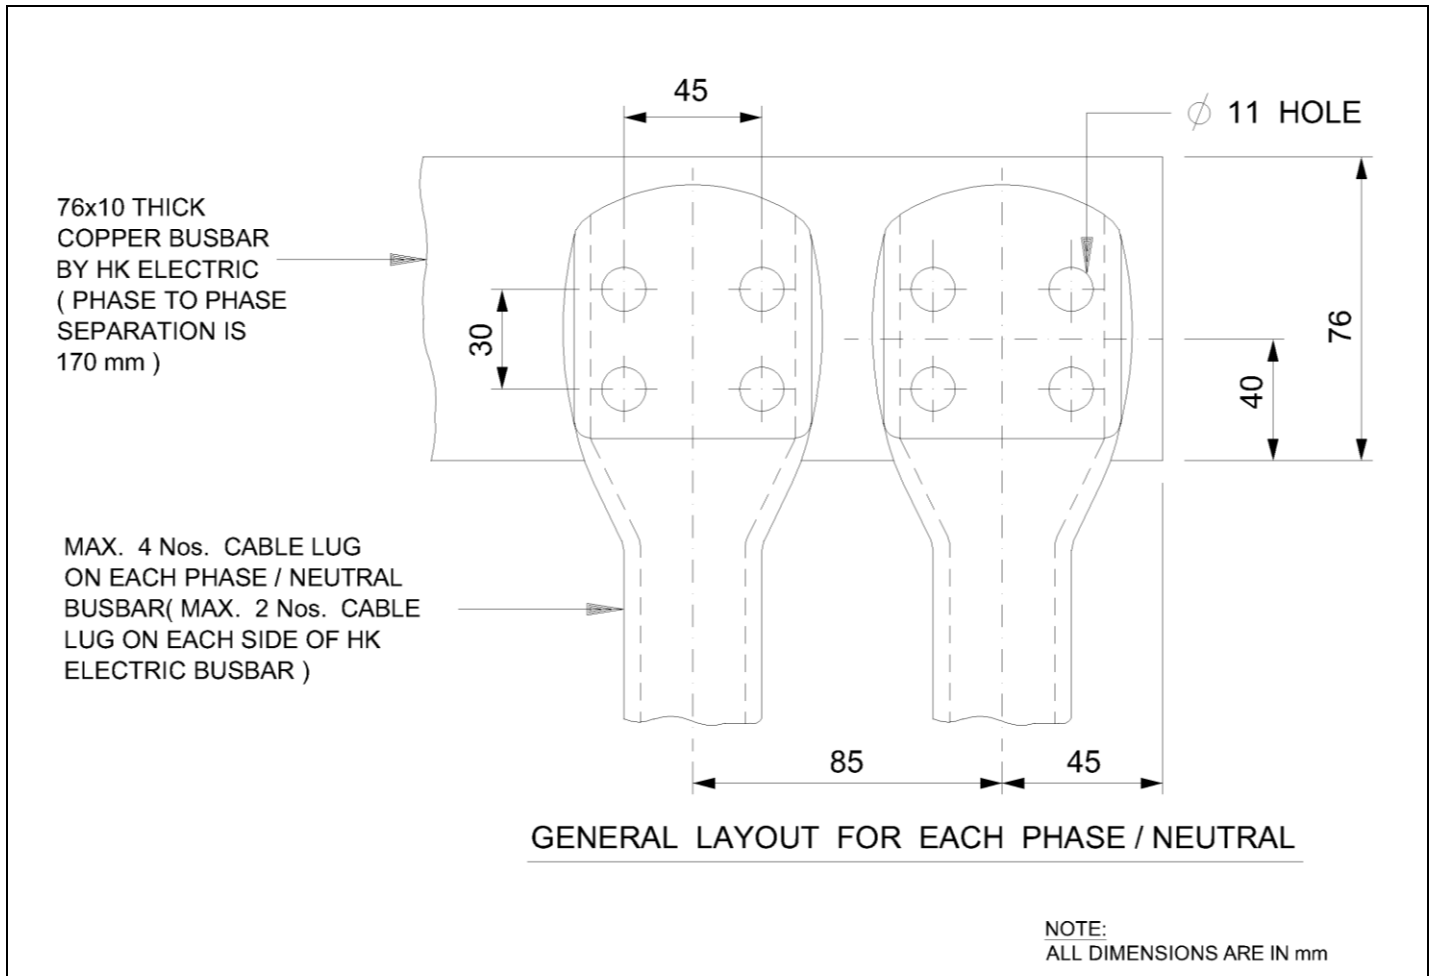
Arrangement for Single-core Cables Connected to HK Electric Substation
